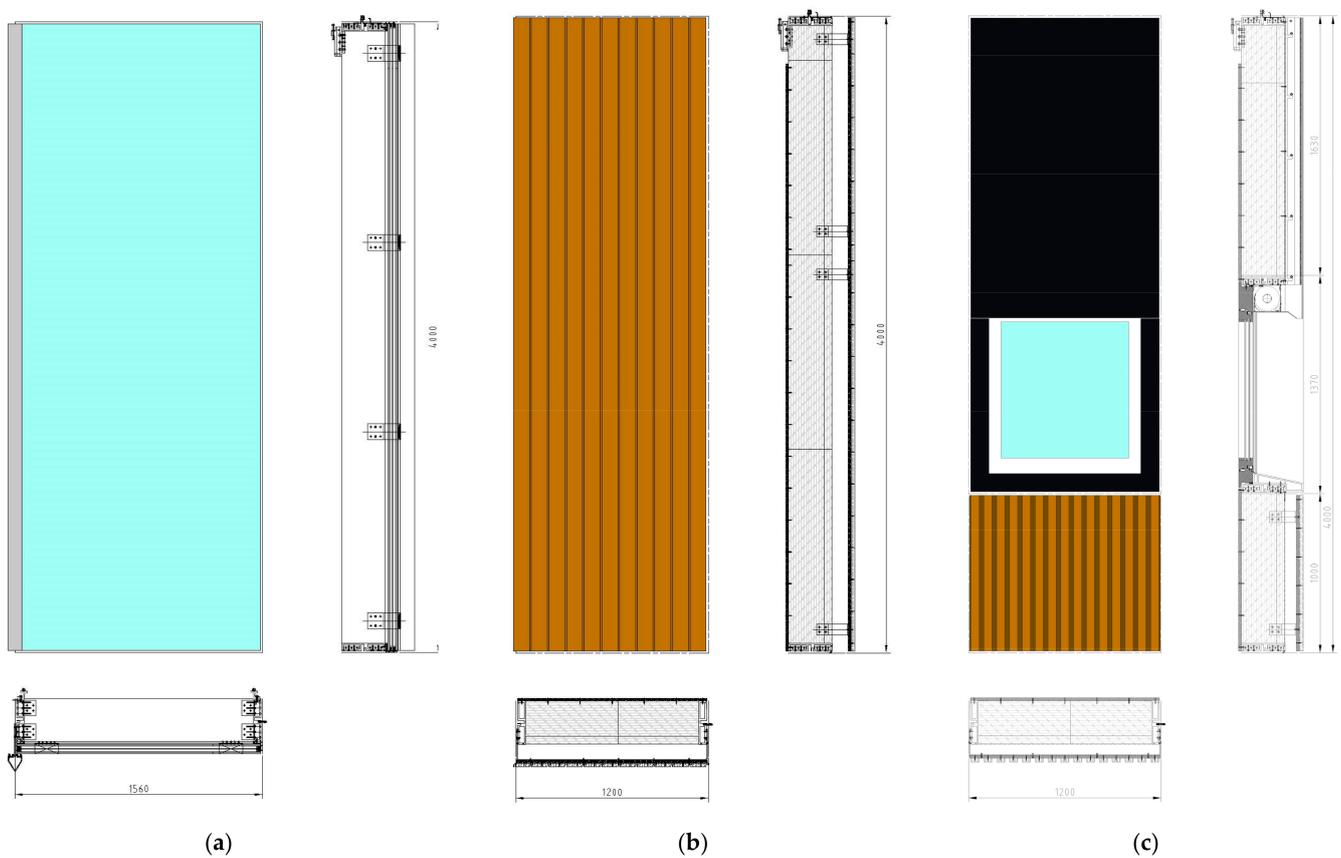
Drawings of façade modules (elevation, vertical section on the right, horizontal section at the bottom): vision façade module (a); opaque façade module (b); window façade module (c).
